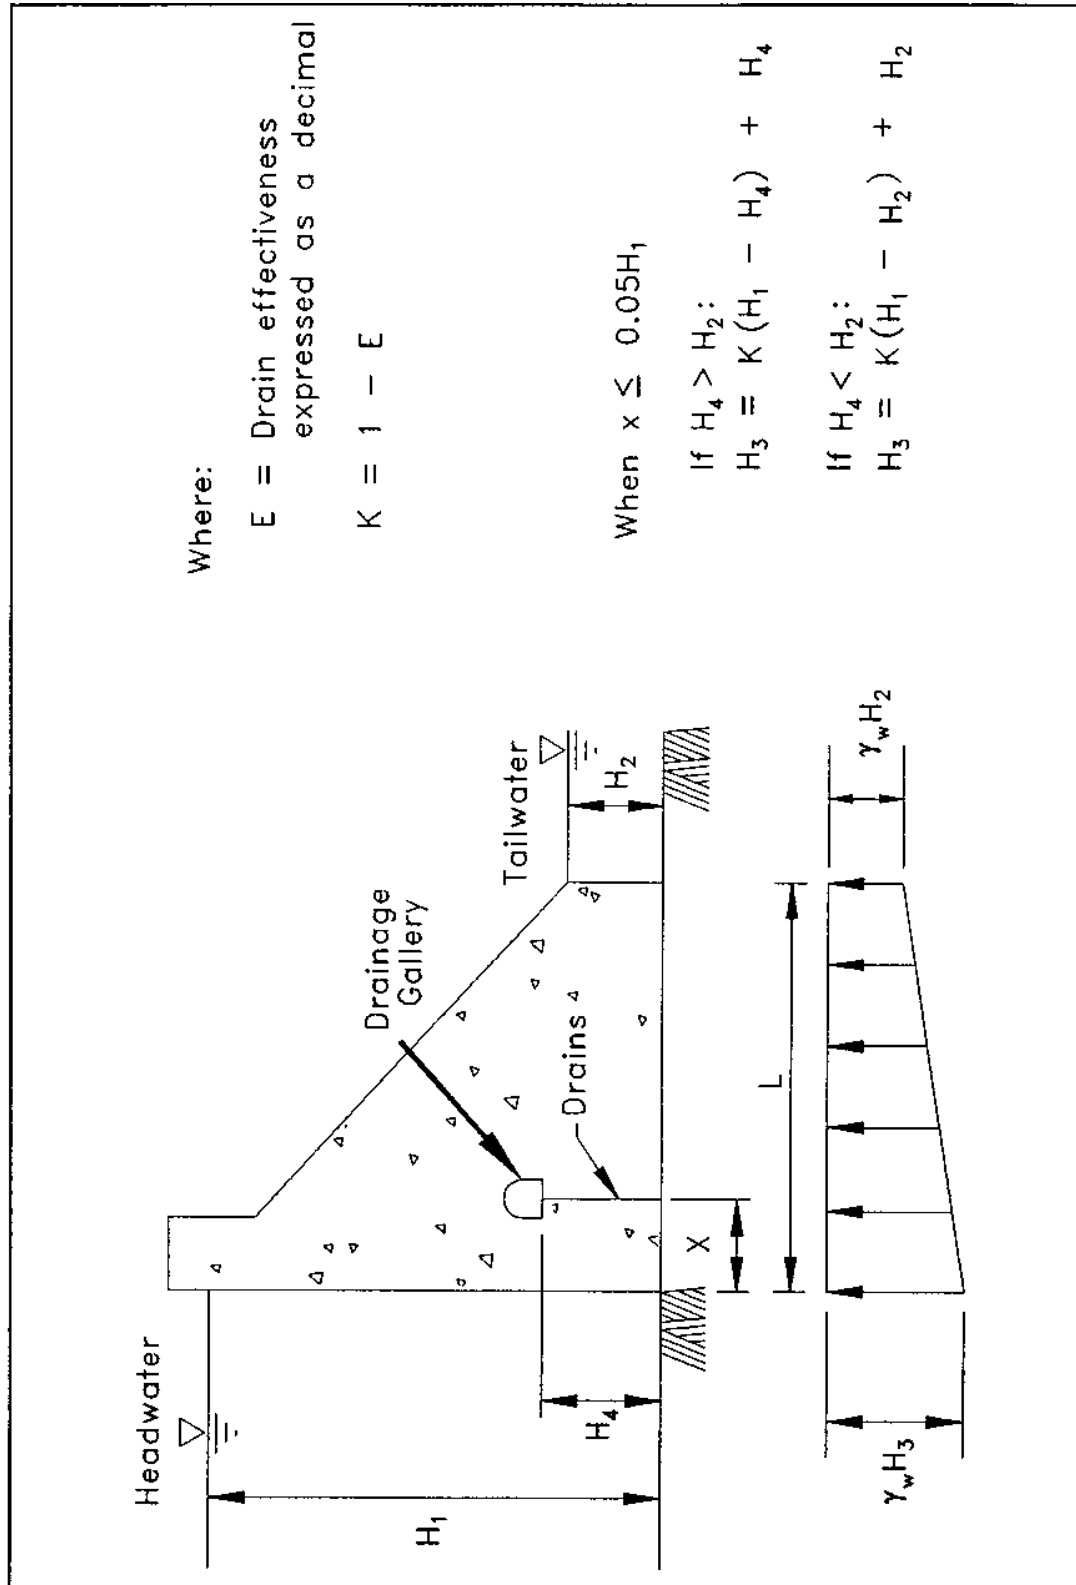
Ussage uplift distribution with foundation drains near upstream face (no cracking).
